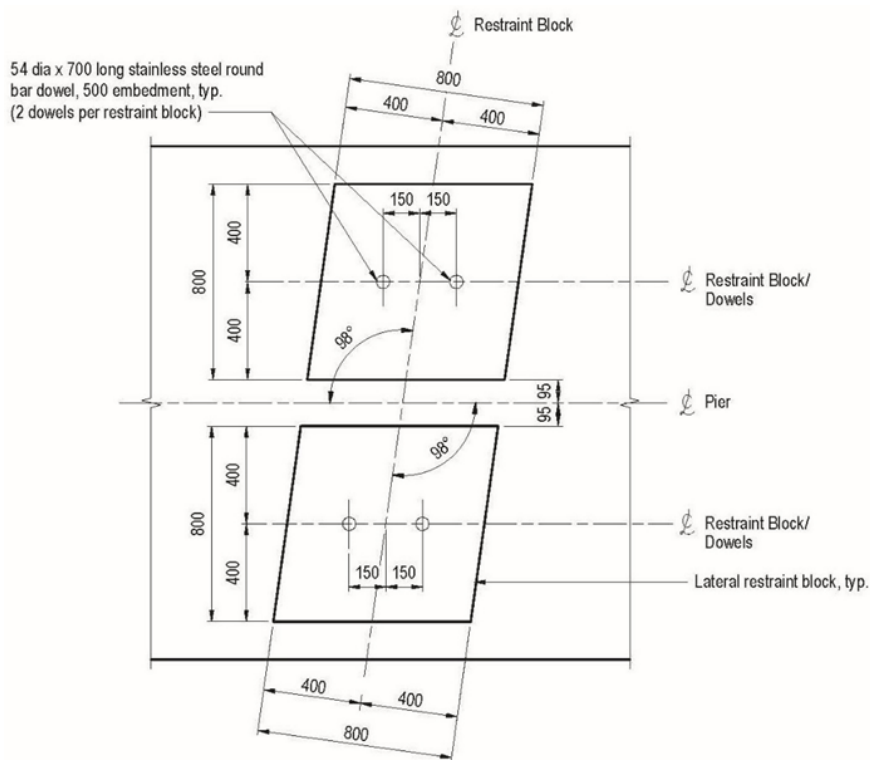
(d) – Example pier pedestal concrete details for skewed bridge
